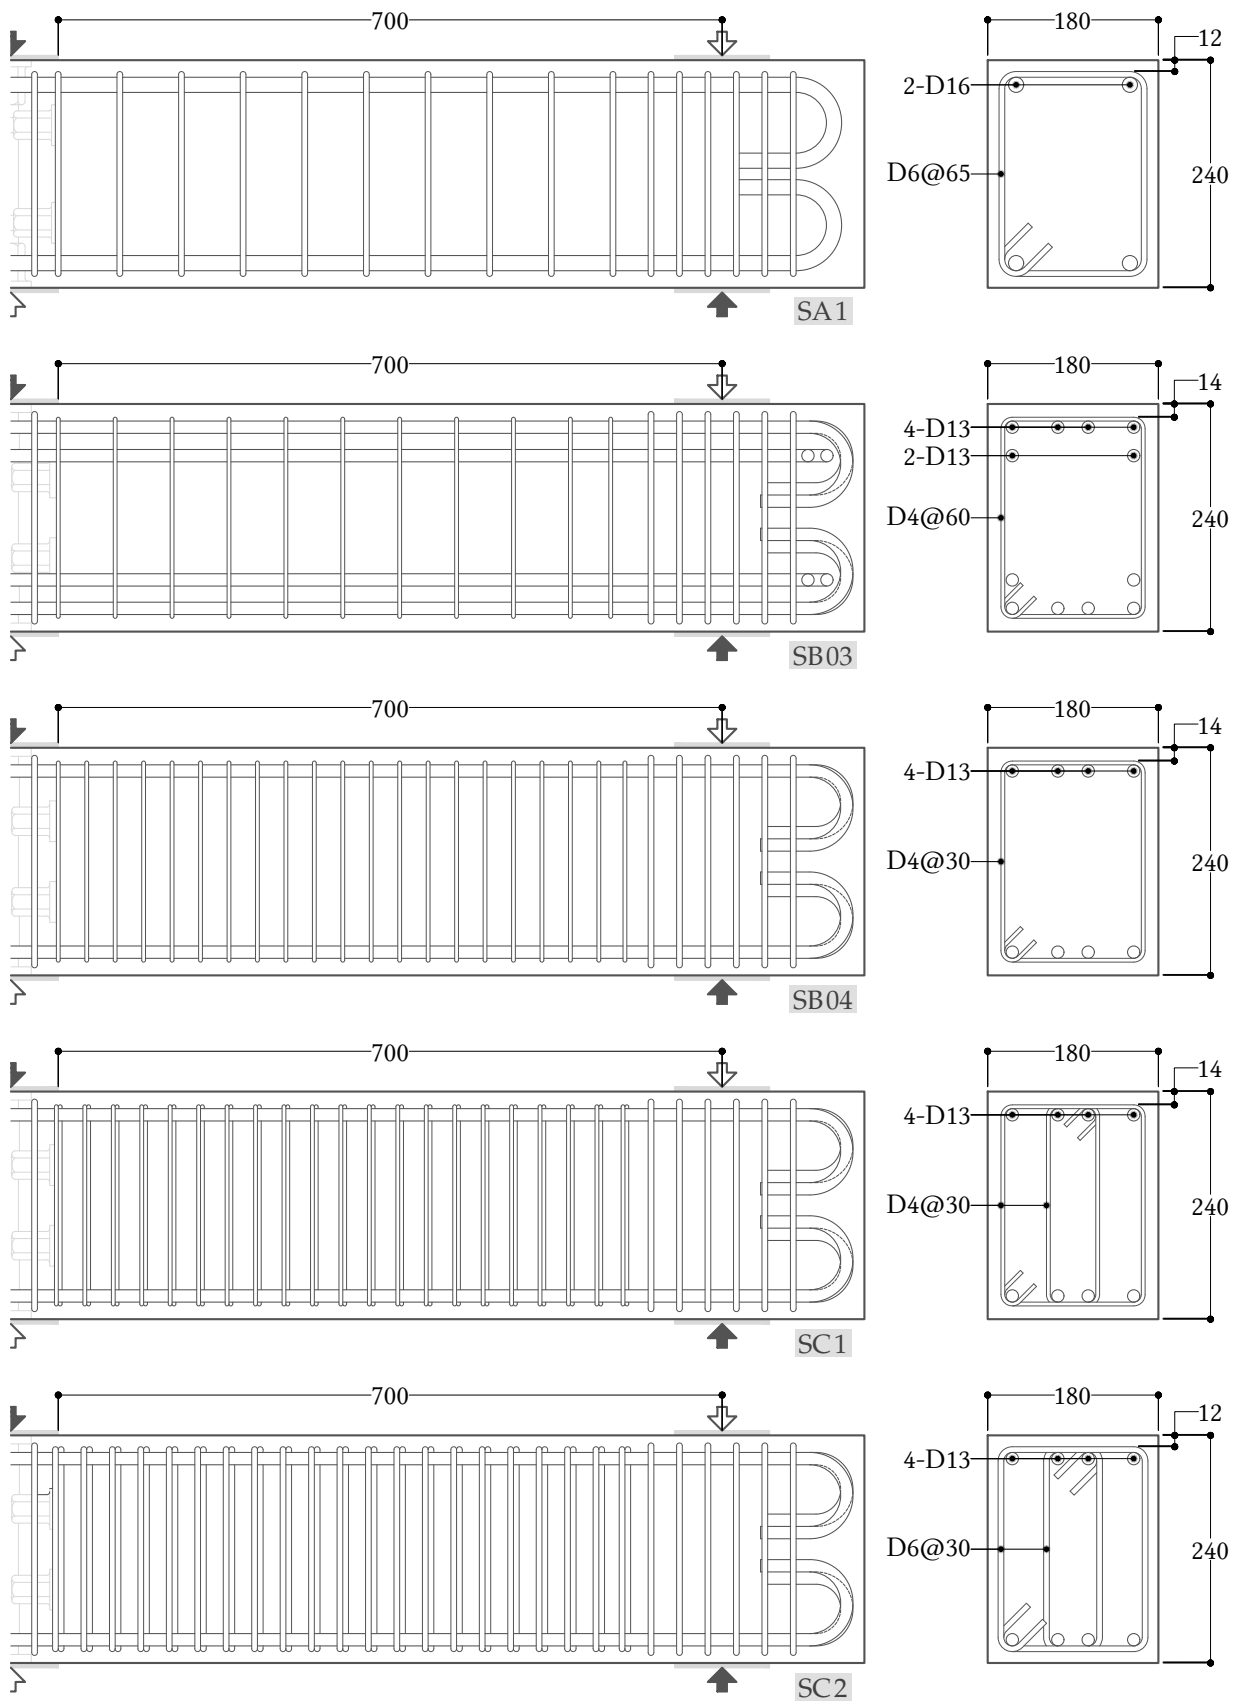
Specimen reinforcement details (all dimensions are in mm)
